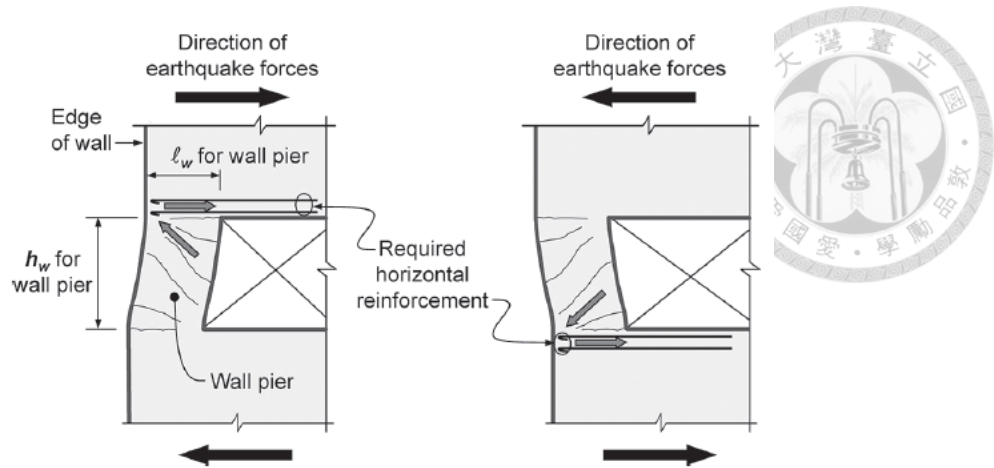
Required horizontal reinforcement in wall segments above and below wall piers at the edge of a wall.
